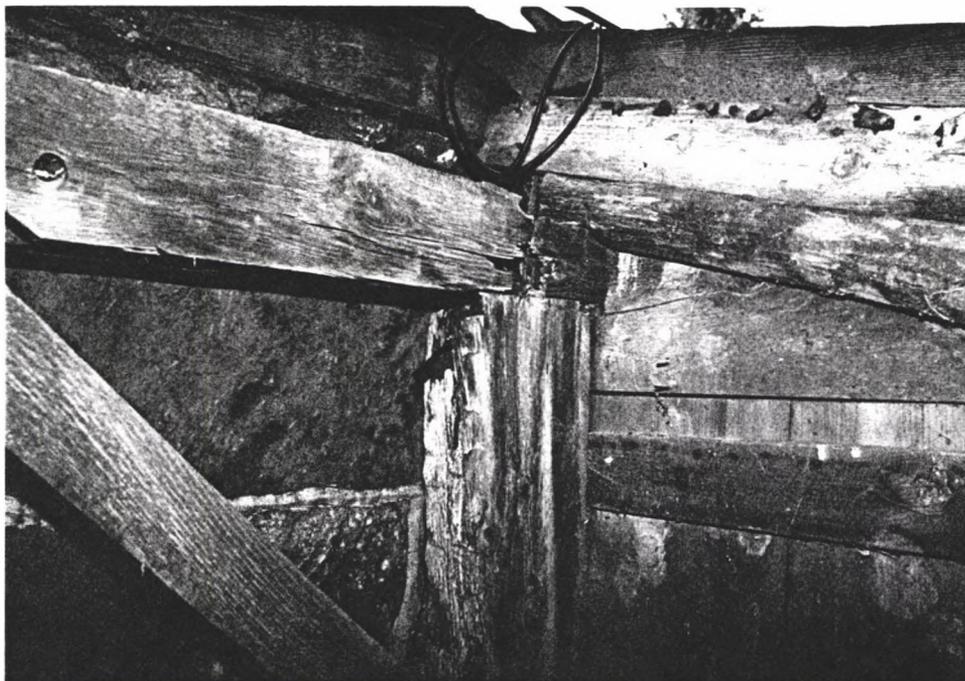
Roof rafters in frame addition. National Park Service photo taken during recent re-roofing.
